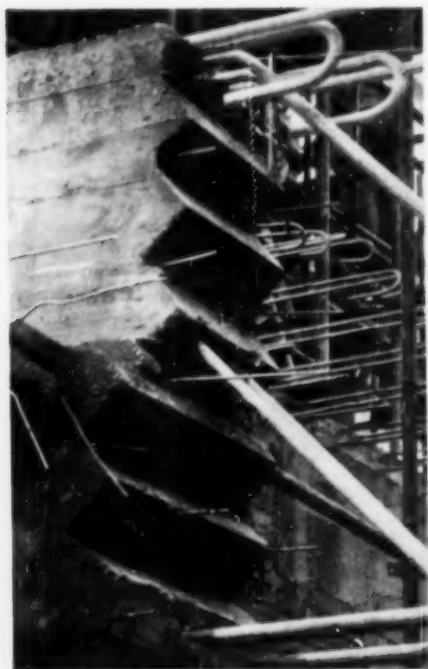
A Construction Joint in a 6-ft. Deep Beam.
